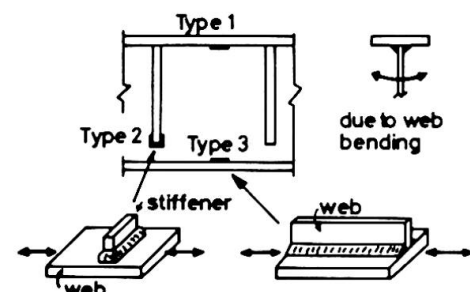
Typical Patterns of Fatigue Cracks
